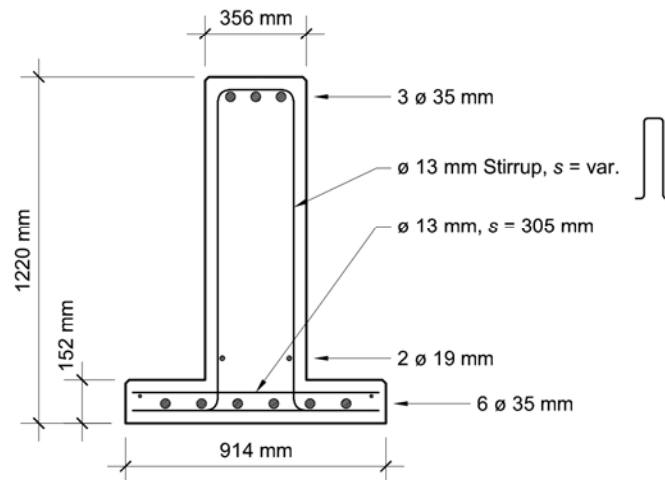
Specimen cross-section shown in inverted T (IT) configuration
